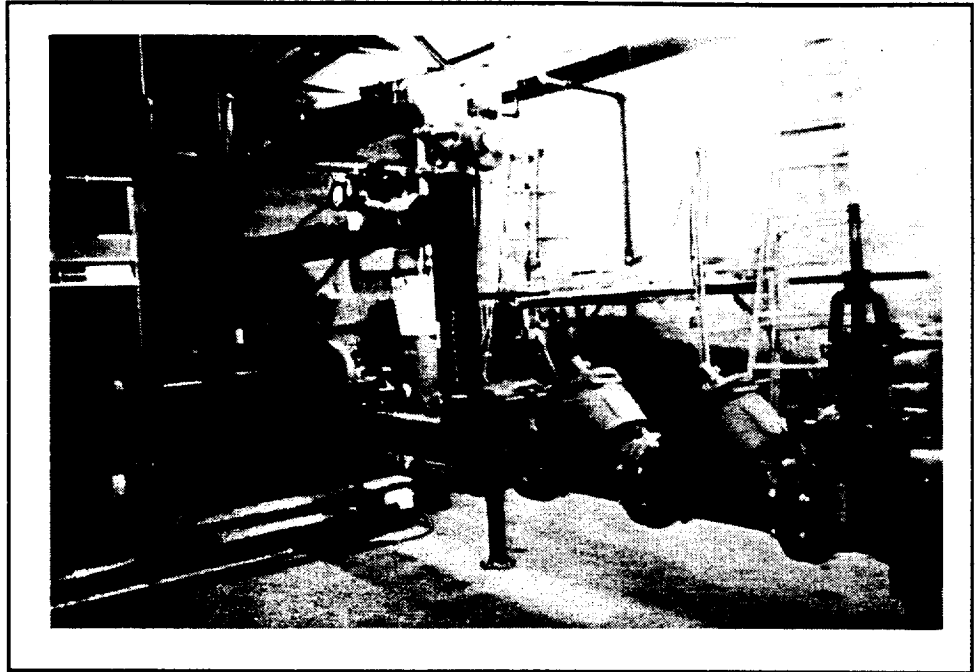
Typical Fire Sprinkler System With Double Check Valve Assembly.
